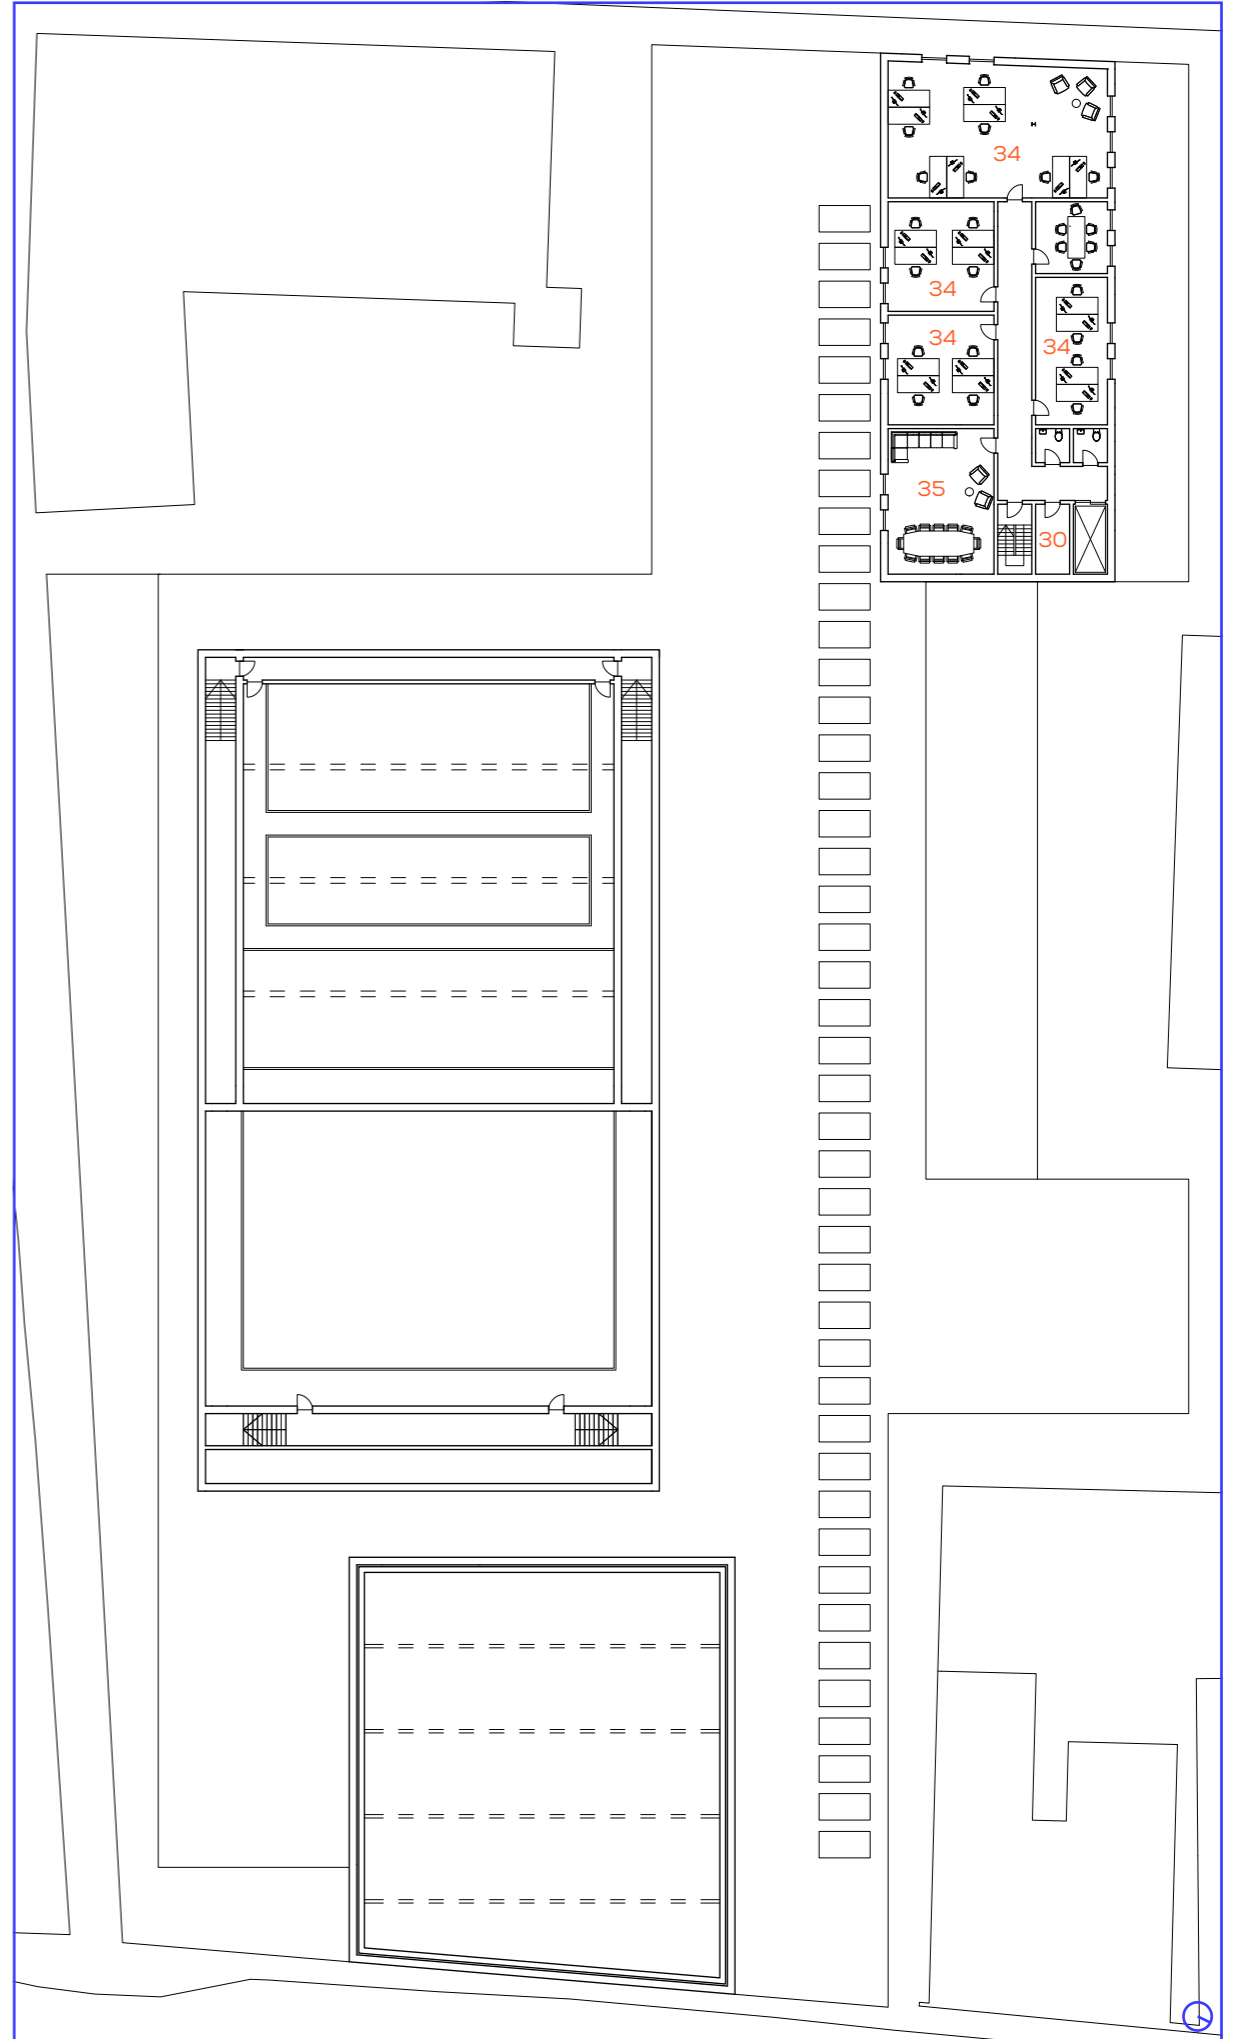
Floorplan third floor drawn on scale 1:200, scaled to 1:400
